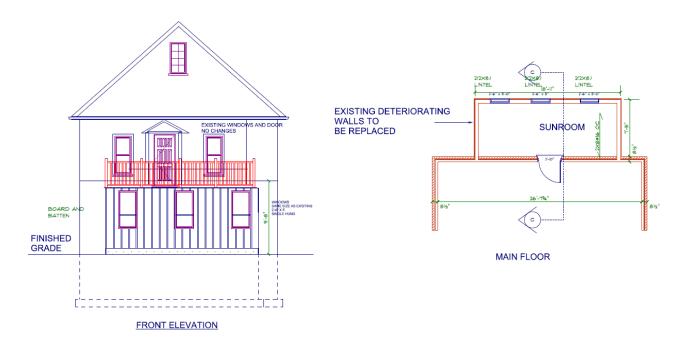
Construction Drawings of the Proposed New Sunroom
